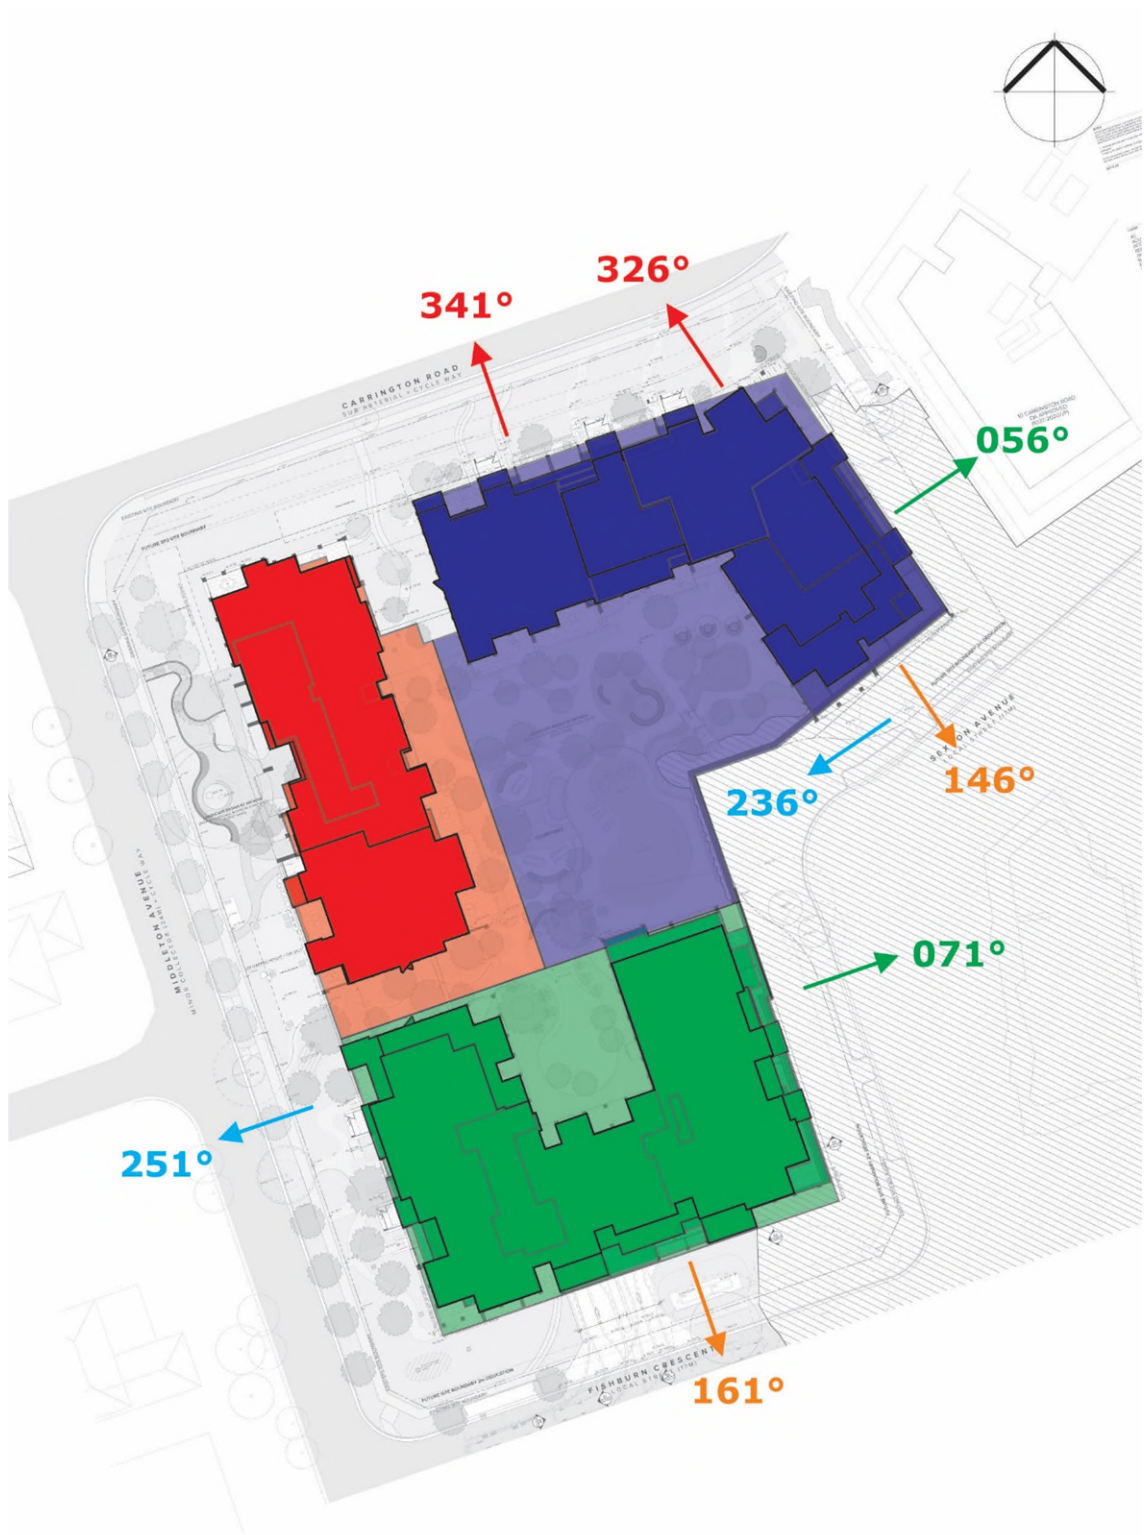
Critical Glazed Aspects of the Development (Ground Floor plan shown)
